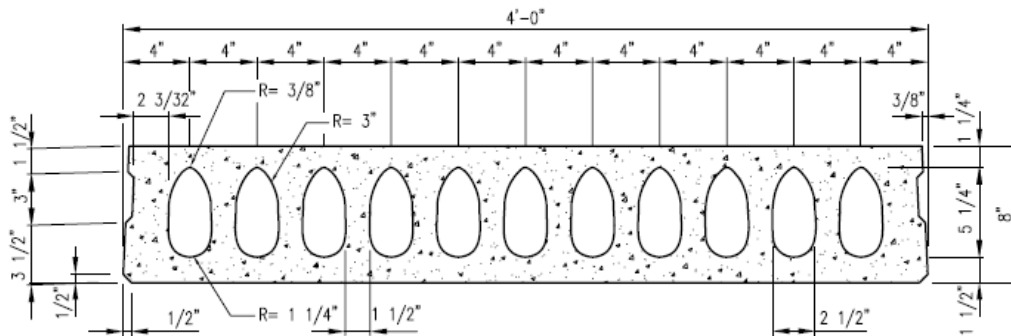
Cross section of the precast prestressed concrete hollow-core plank (Source: Gate precast company: Specification Details).
